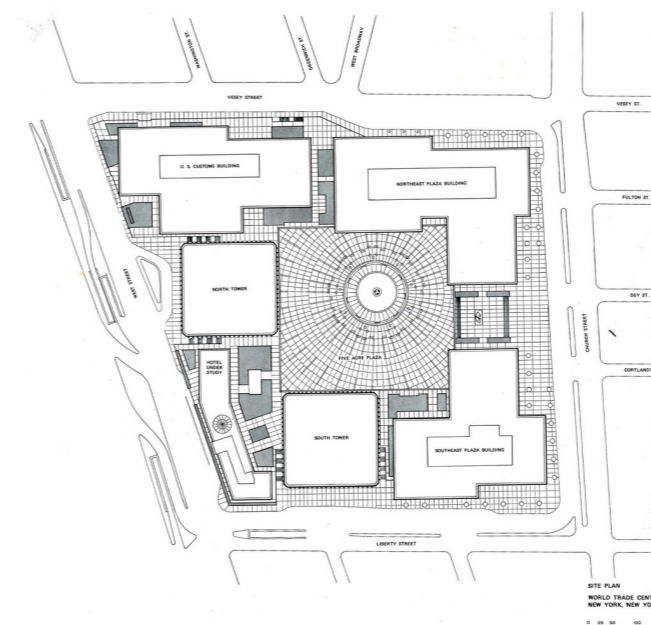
Site Plan World Trade Centre New York (Minoru Yamasaki Associates + Emery Roth & Sons, n.d.)
